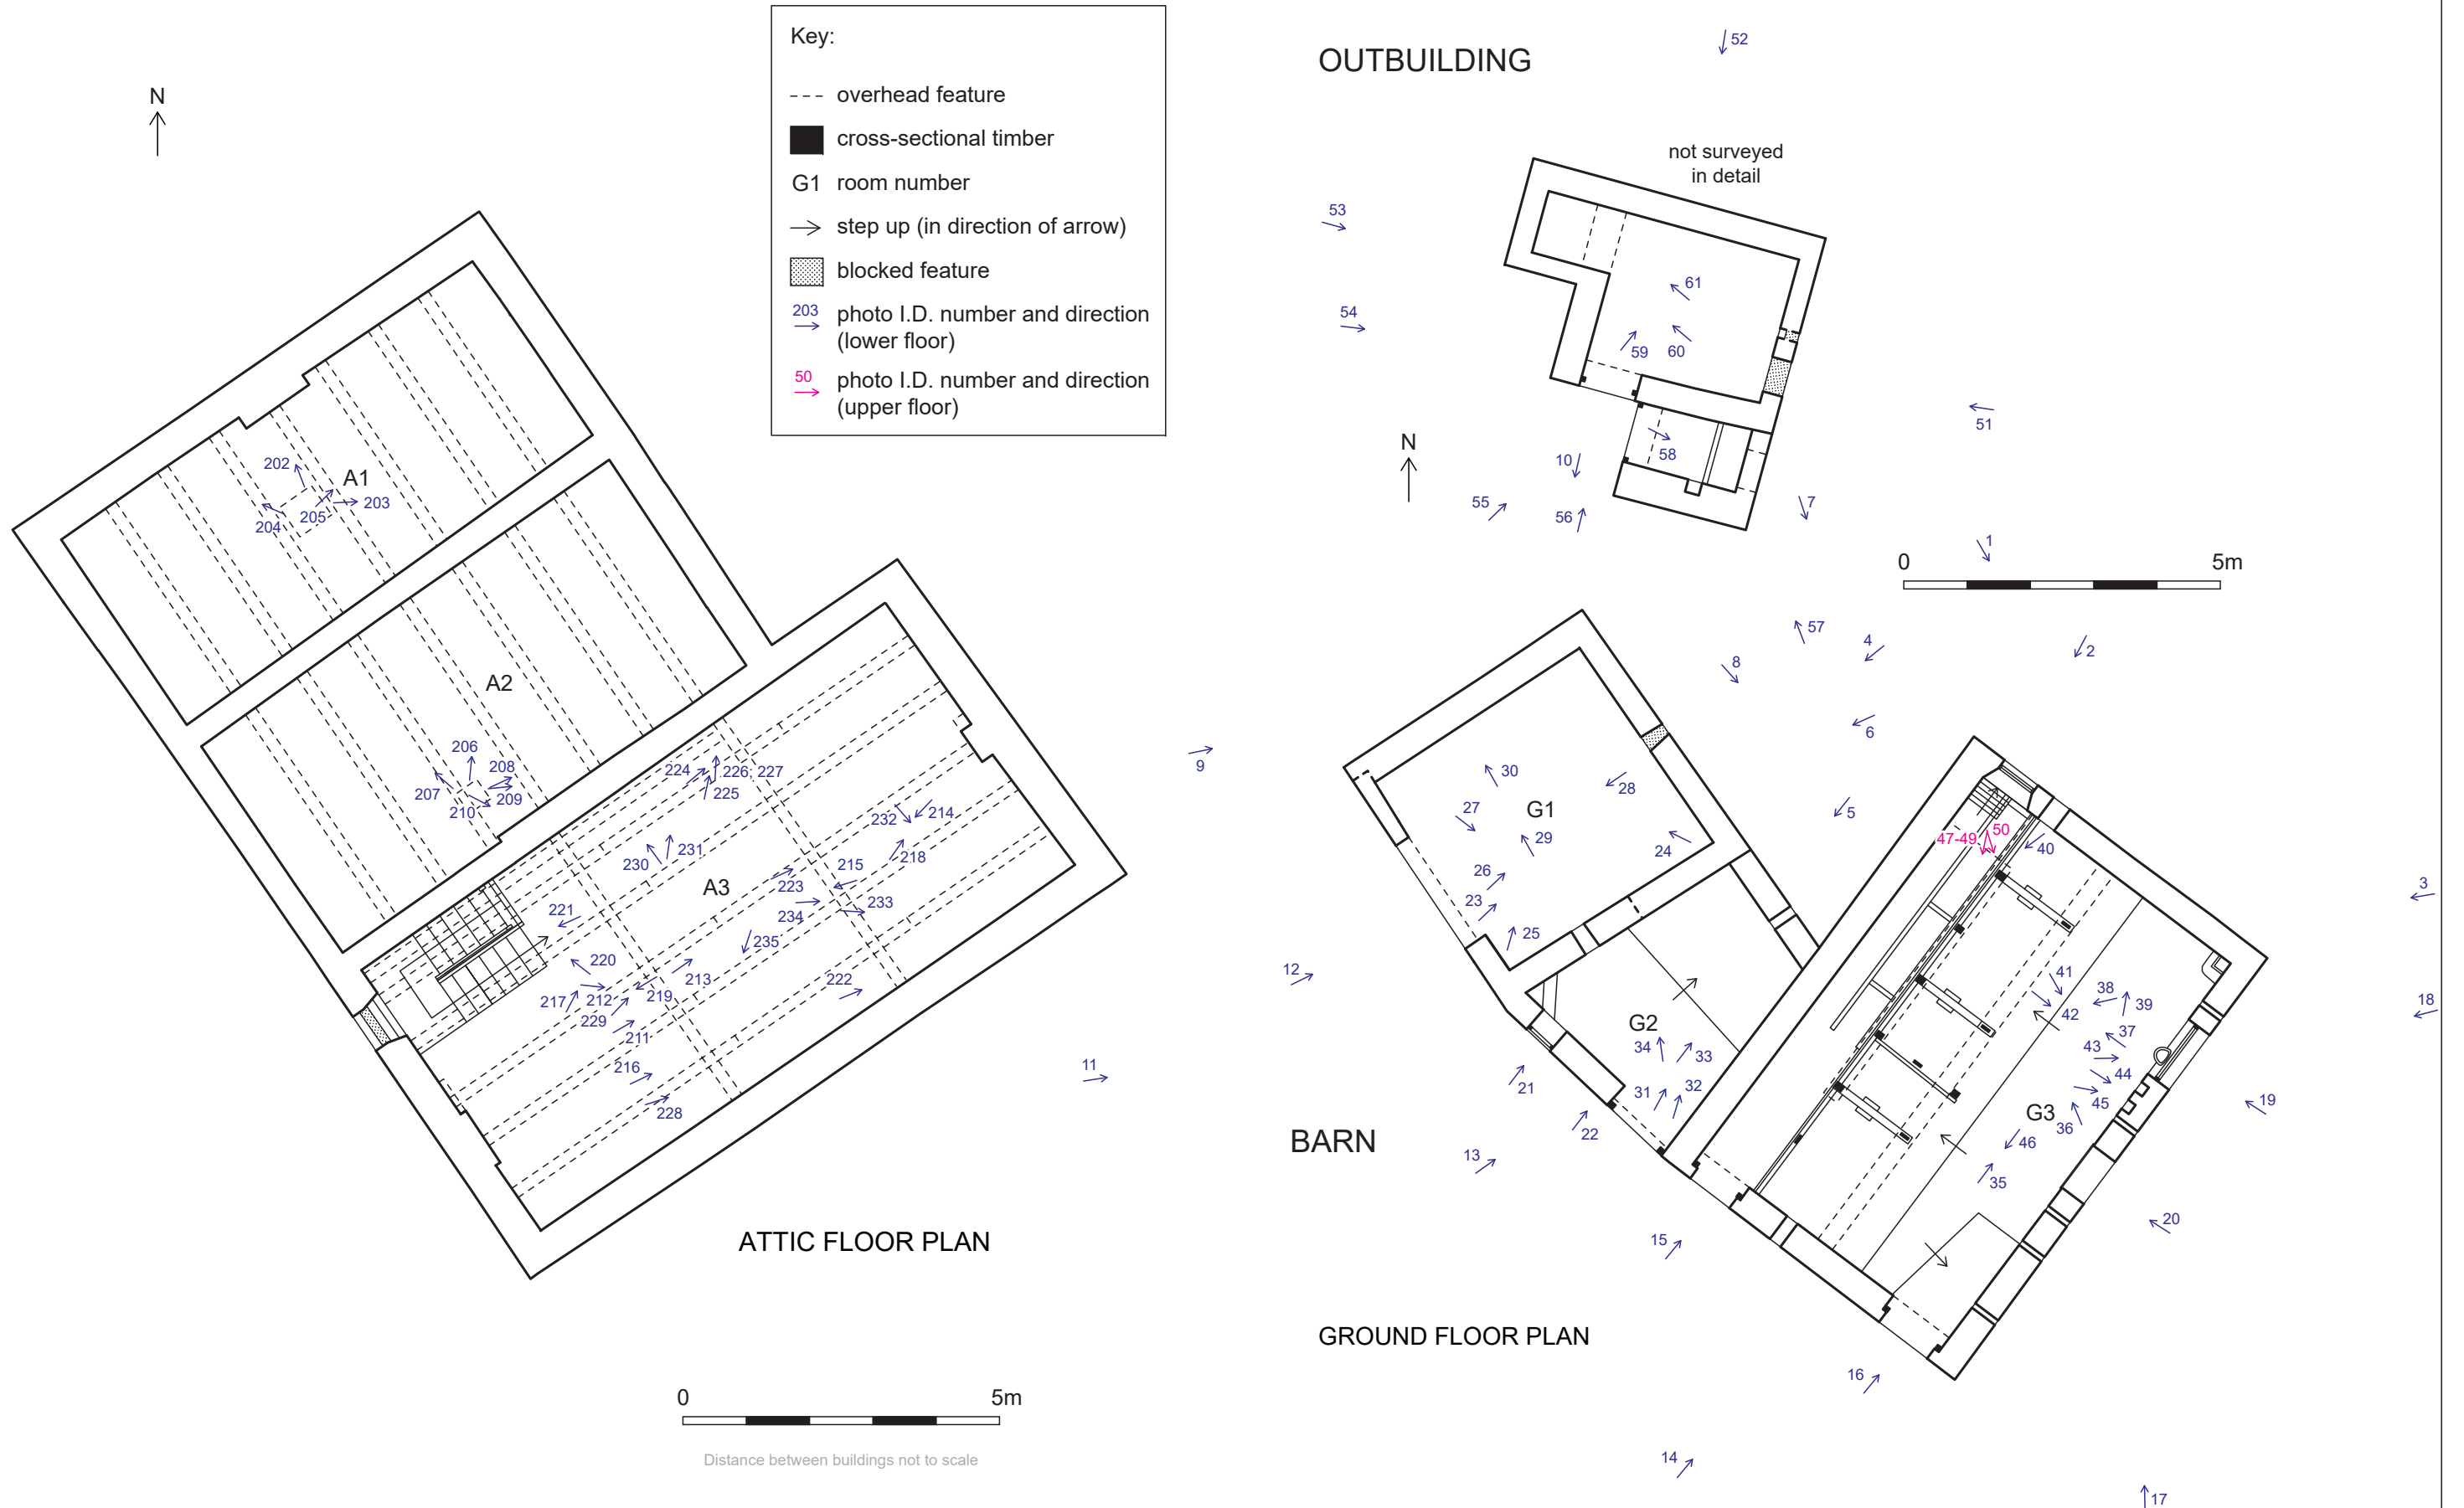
Attic floor plan of the farmhouse and ground floor plans of the barn and outbuilding, showing the location and direction of photographs taken
